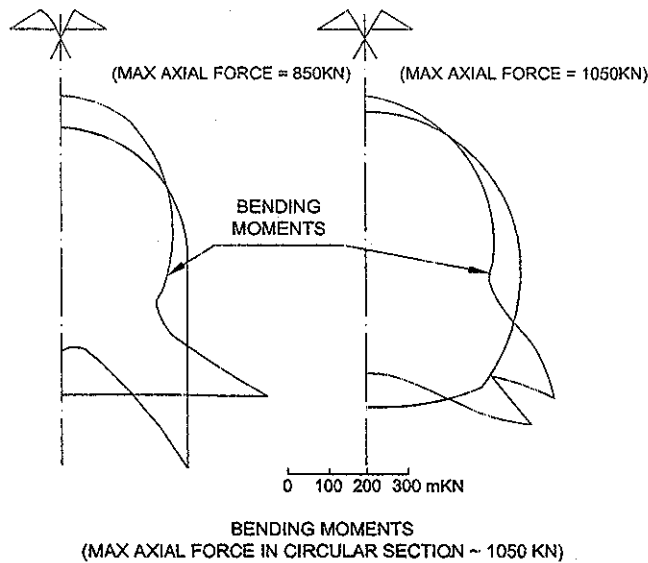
Stress laws for two sections and volumetric expansion for the entire perimeter of the tunnelled area
